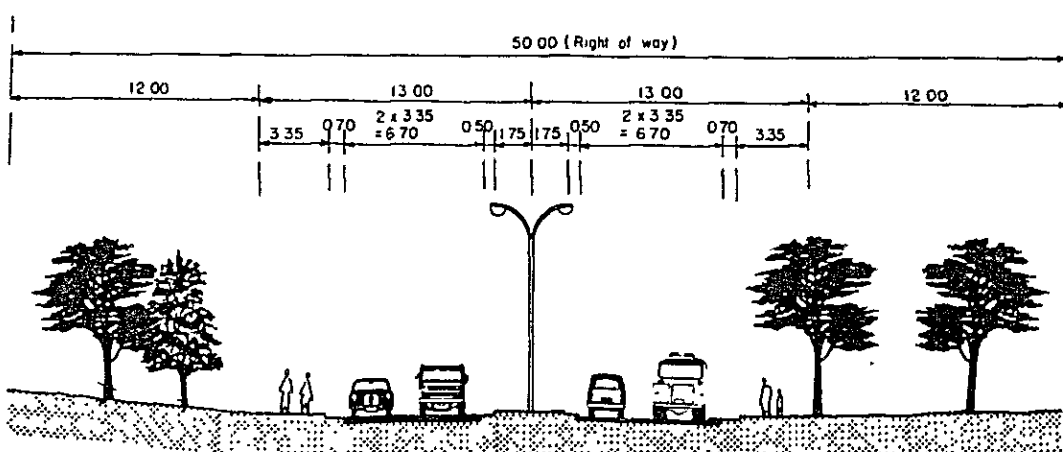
TYPICAL CROSS SECTION OF VIA MARTIN SOSA EXTENSION
